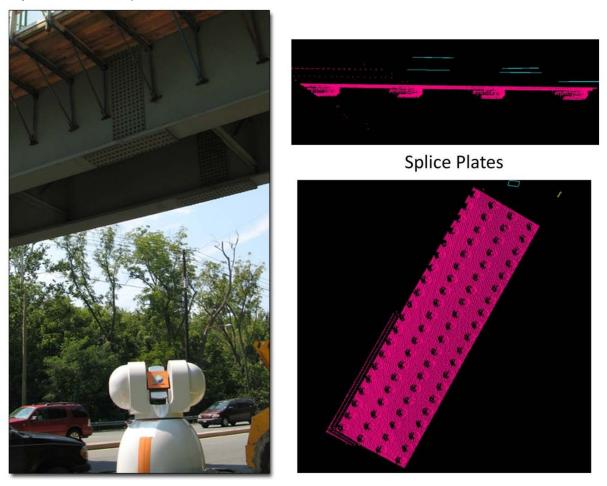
Measurement of a steel girder splice plate over live traffic.
